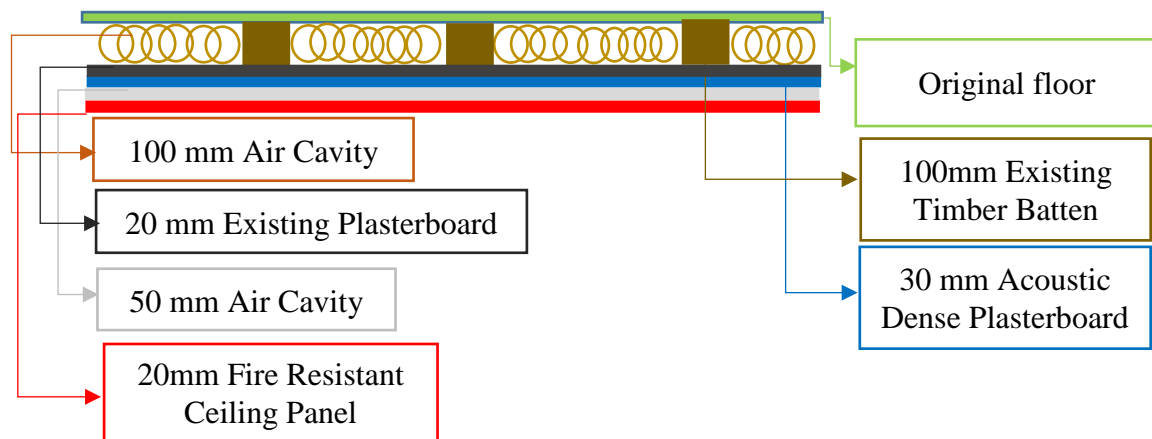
Suggested multi-layer ceiling scheme for additional sound insulation.
